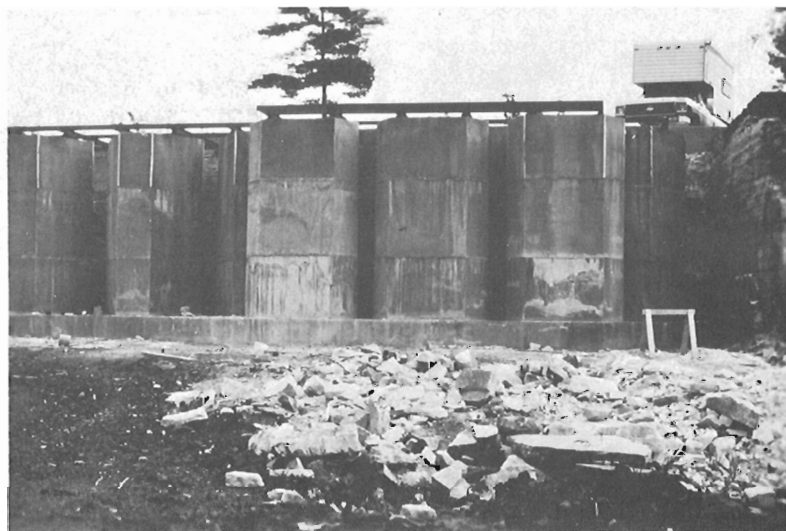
The nine concrete test columns viewed from inside the quarry showing the "ore zones" and a logging truck parked above in the working area for calibrating logging systems. (GSC photo 203254-0).
